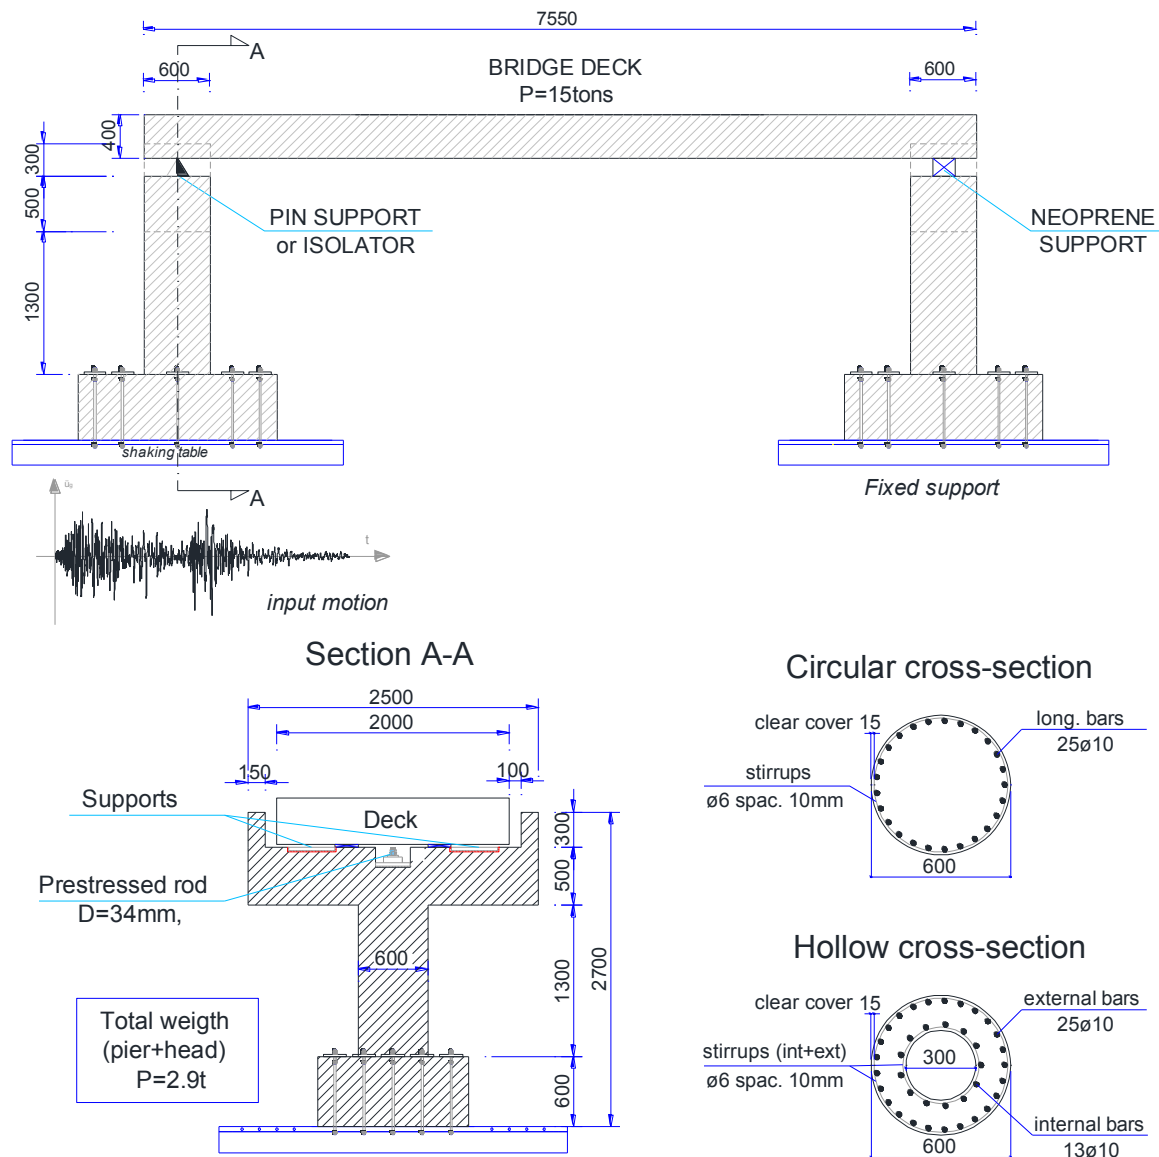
Details of the 1:3 scale bridge subassemblies (dimensions in mm).
